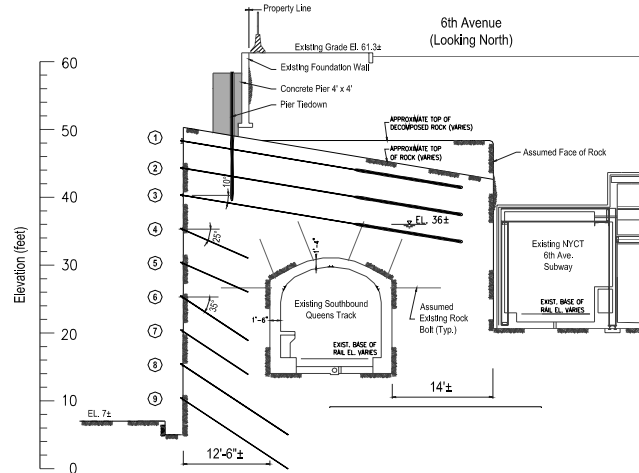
BOA Section at 6<sup>th</sup> Avenue along NYCT Mined Tunnel
